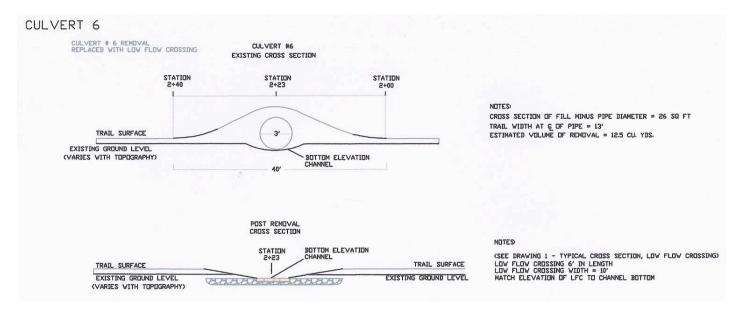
Culvert Removal Culvert # 6 Station 2+23
